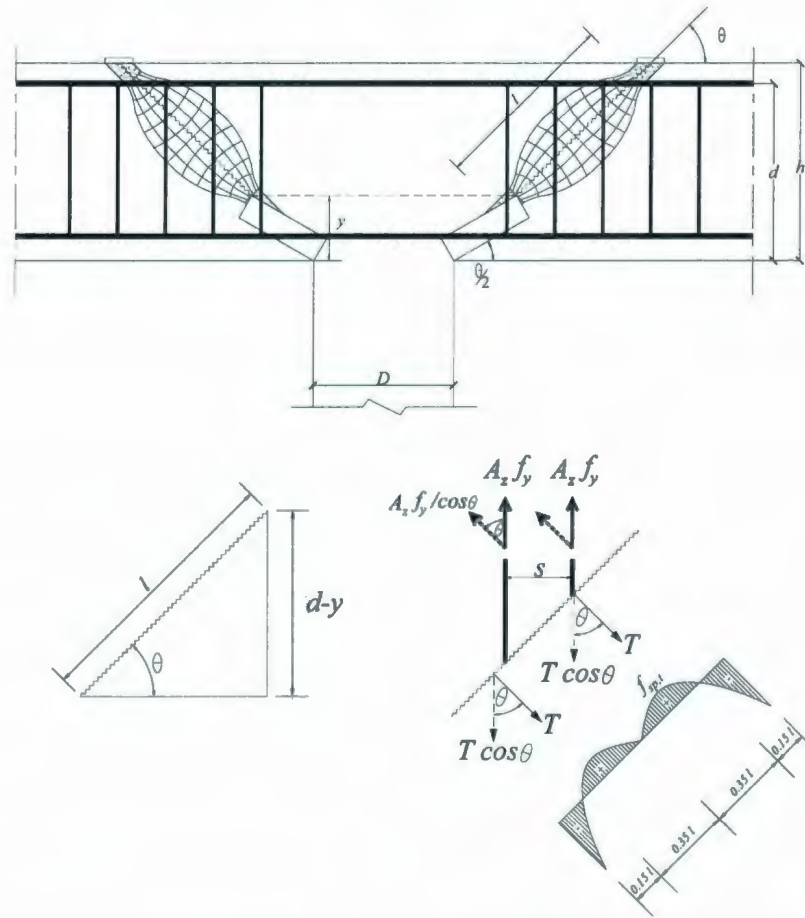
Strut and tie model for a slab column connection reinforced with minimum shear reinforcement
